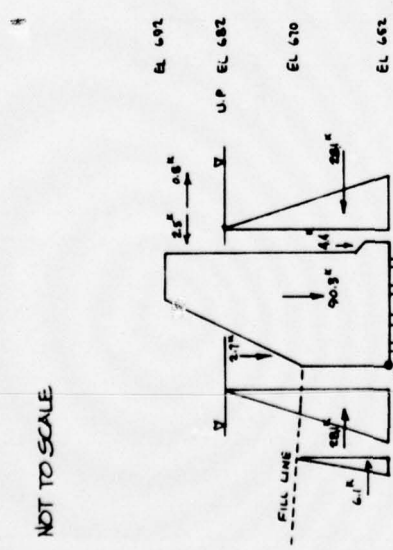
LAND WALL - UPPER GUARD WALL NONDUTCH L-5
